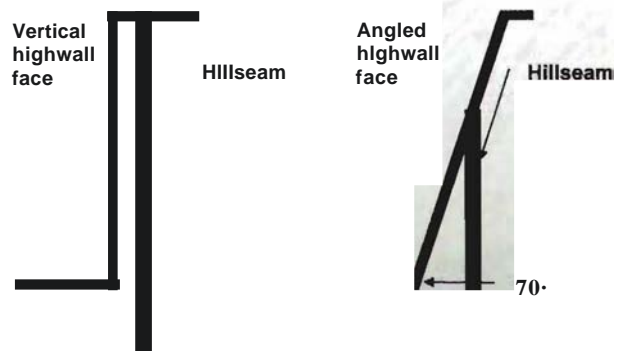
Vertical highwall containing hillseam (left) and 70' highwall with hillseam (right).
